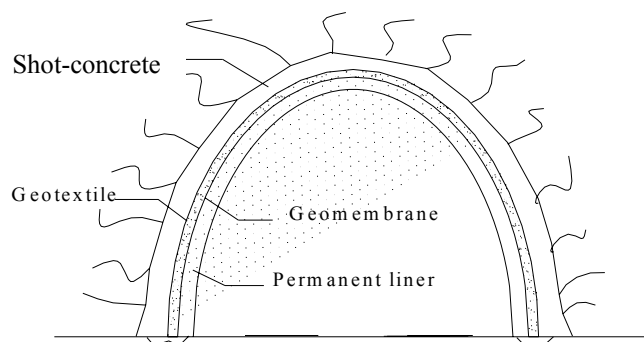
g Geosynthetic Use for Tunnel Waterproofing
